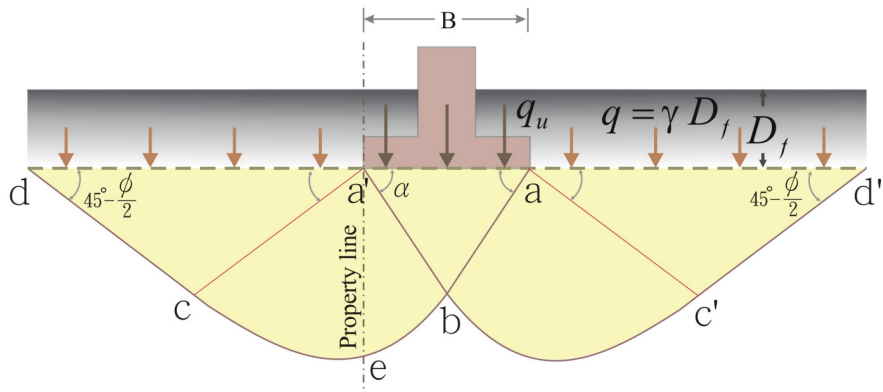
The bearing area surrounded by sliding failure surface under foundation ultimate load
